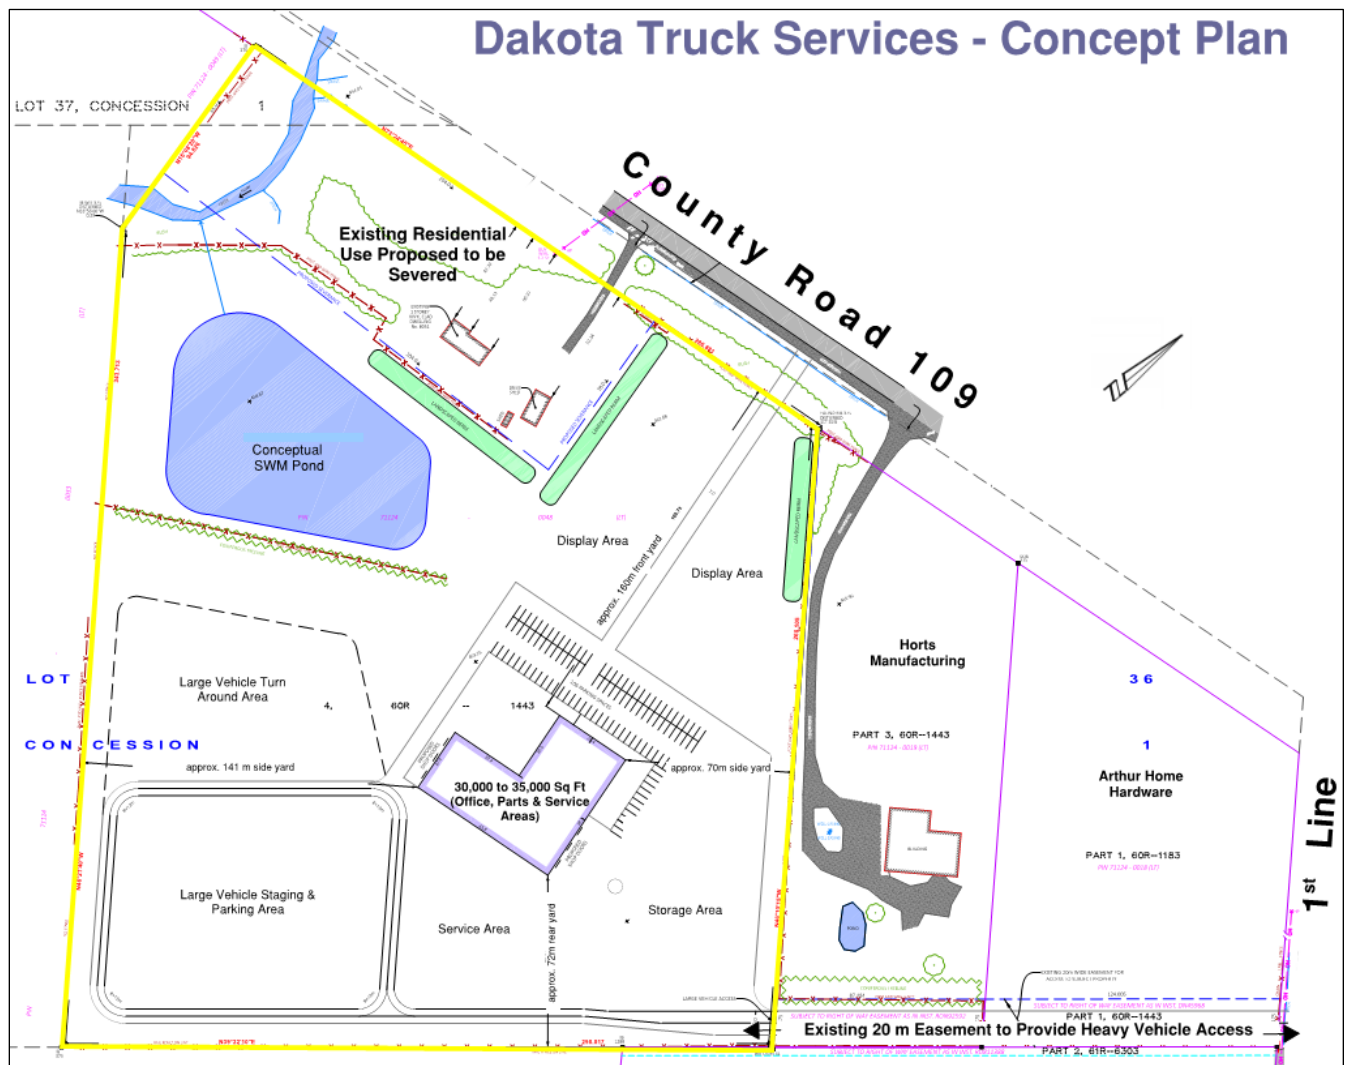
Conceptual site plan for Dakota's Truck Service. Full site plan submitted as part of the OPA application.
